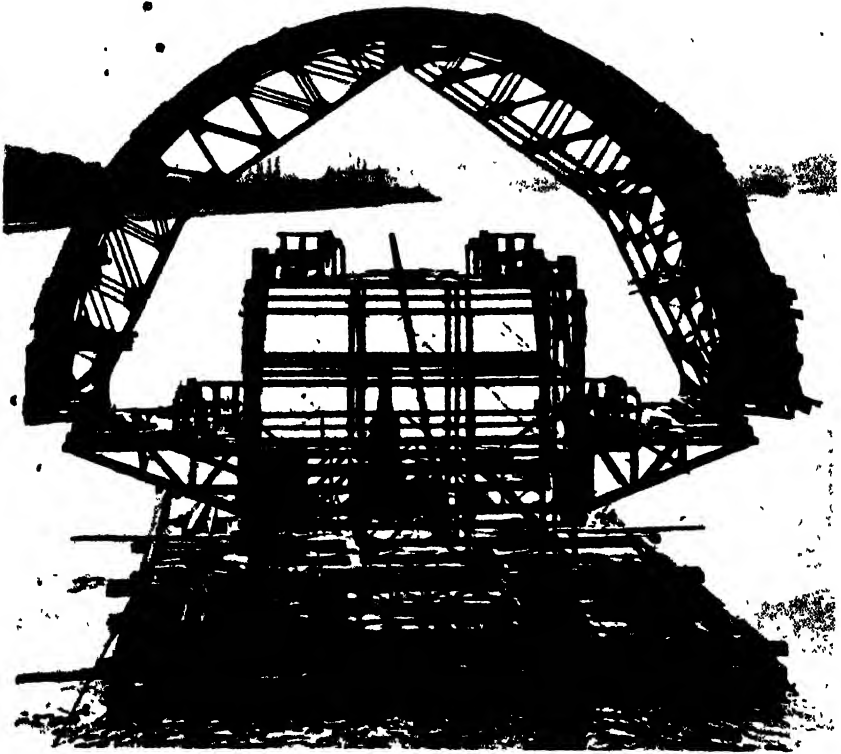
HANDLING STEEL TRUSS CENTRES BY FLOATING INTO POSITION WOOD CAPS, STRINGERS AND LAGGING.
